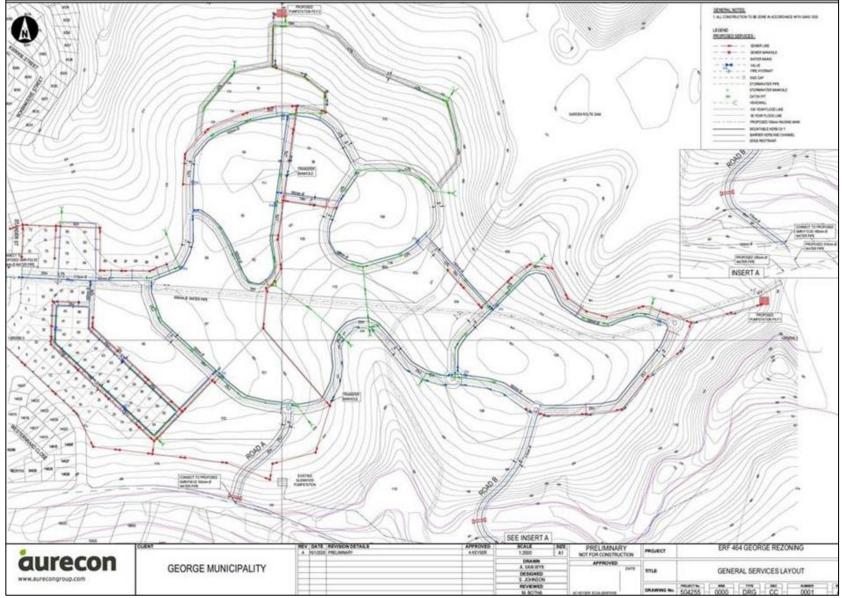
General services layout for the preferred alternative showing road, sewer, and stormwater infrastructure
